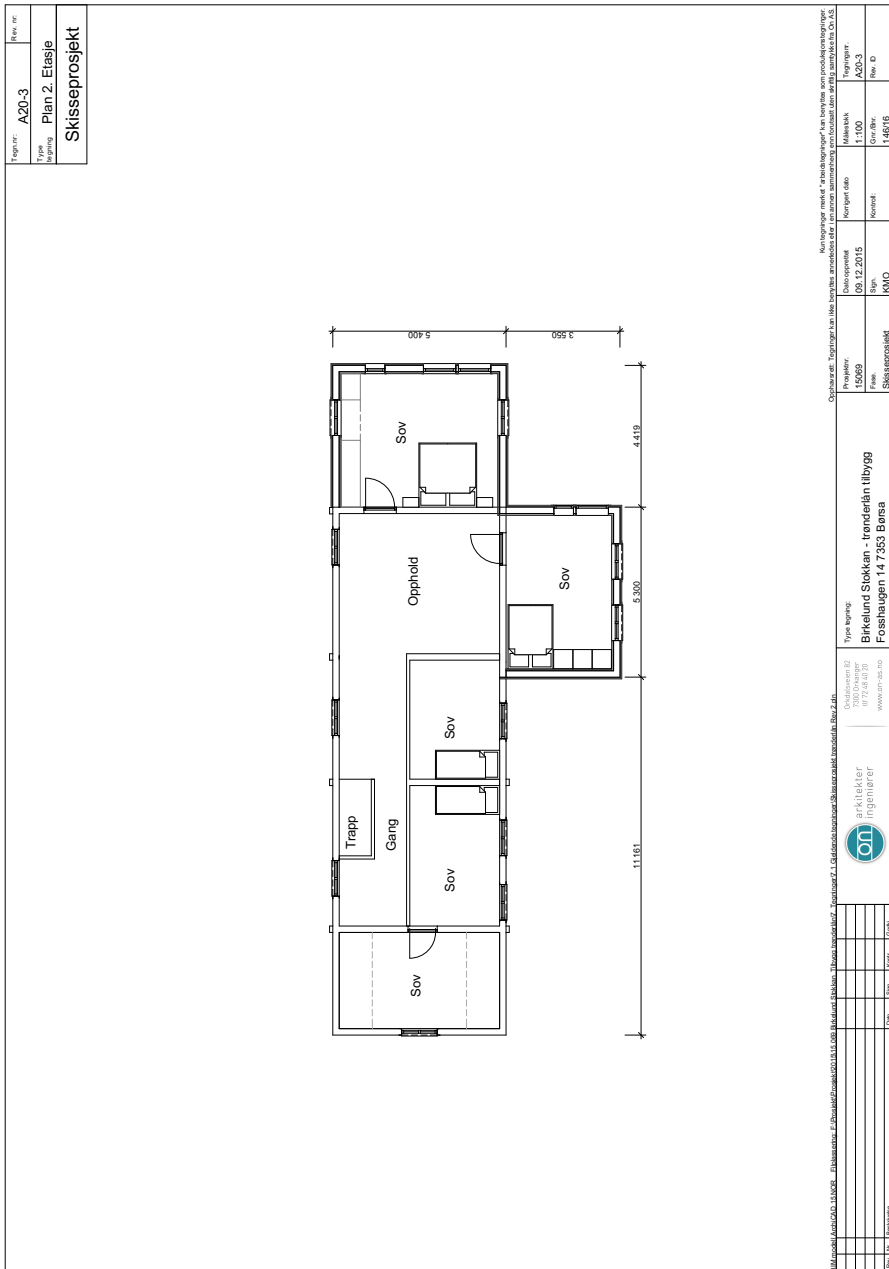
Technical Drawing of house used to design 3D model in PV*Sol.
